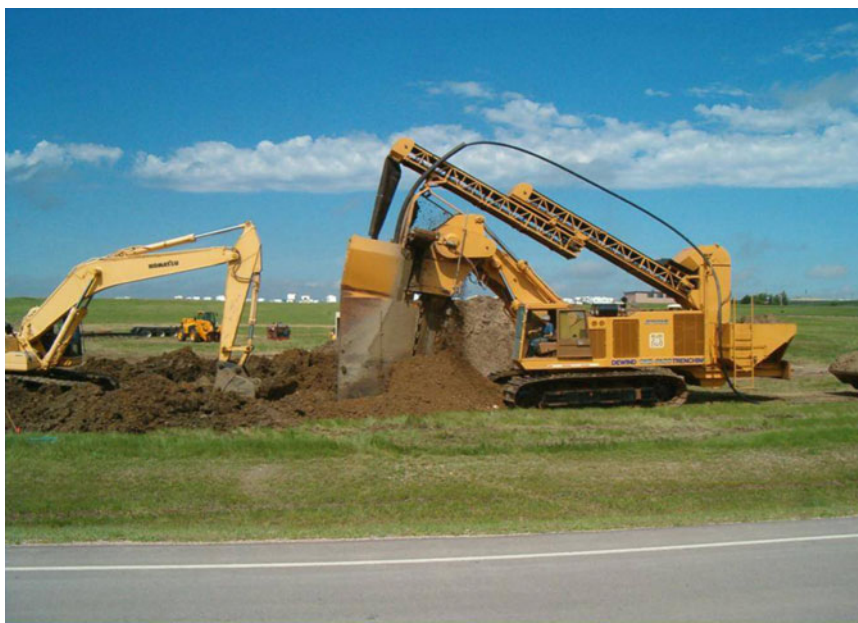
Continuous trenching for biowall installation, Ellsworth AFB, South Dakota, USA (from AFCEE, 2008).
